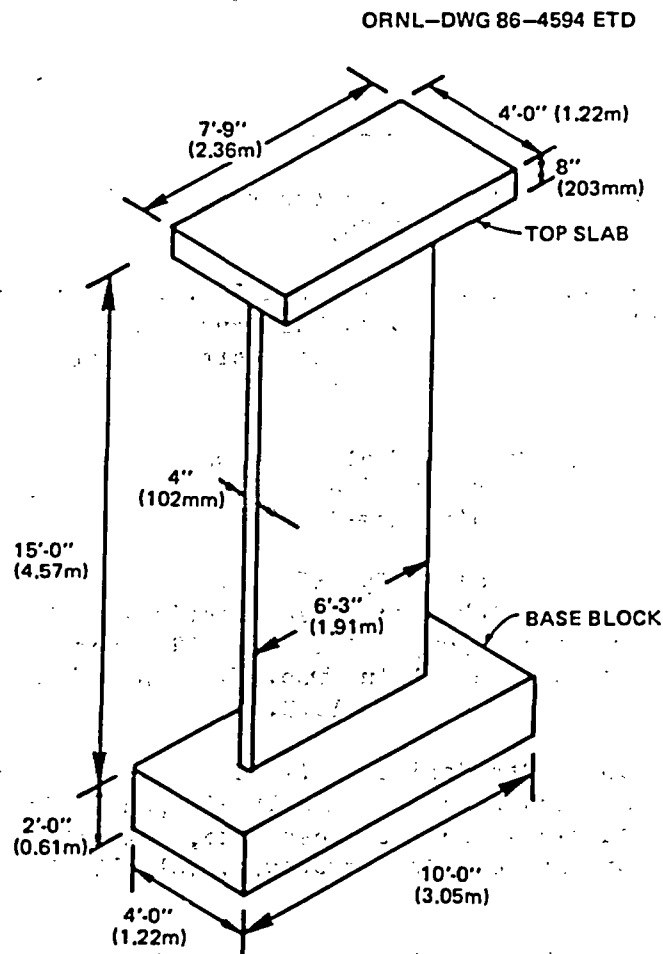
Nominal dimensions of one-third-scale five-story wall test specimens. Source: A. E. Fiorato et al., "Behavior of Earthquake Resistant Structural Walls Before and After Repair," *J. American Concrete Institute* 80(5) (September-October 1983).
